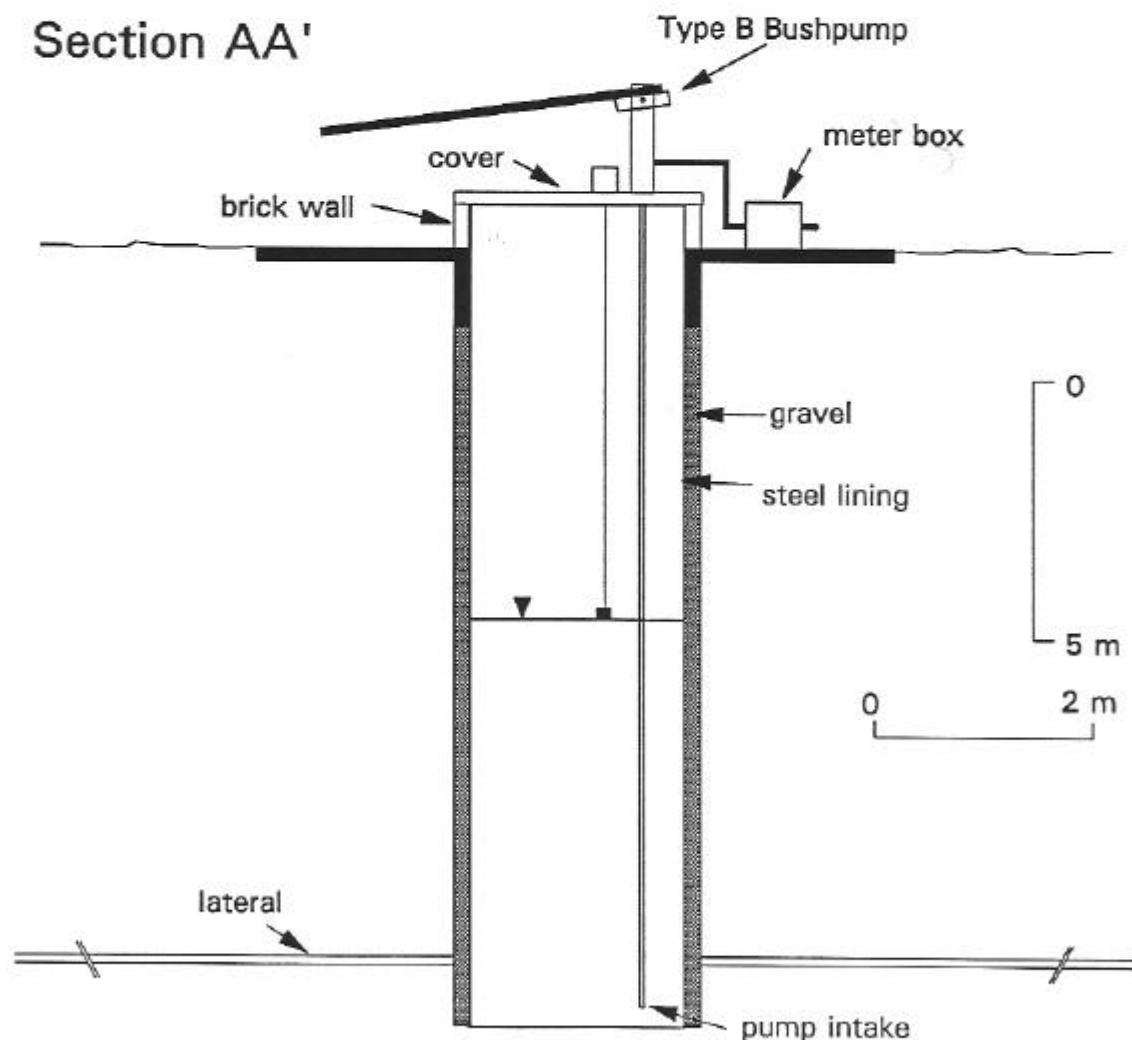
Collector well and headworks construction, site 3, Dekeza
